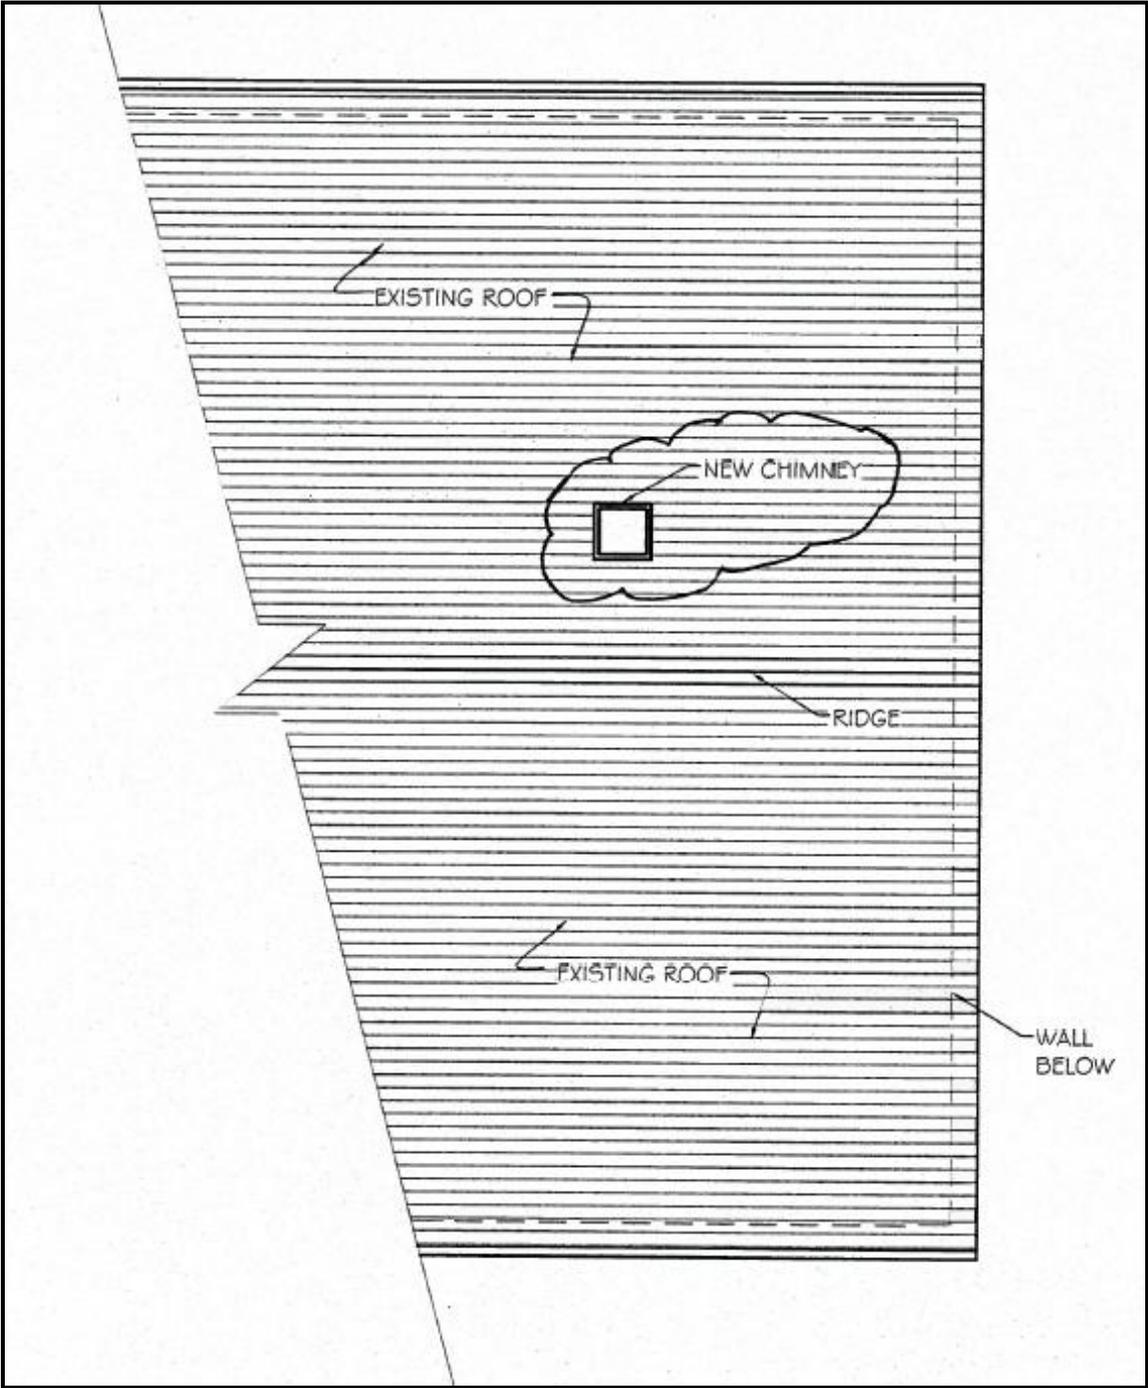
Location of Exhaust Duct Cover/Chimney on Educational Building Roof
